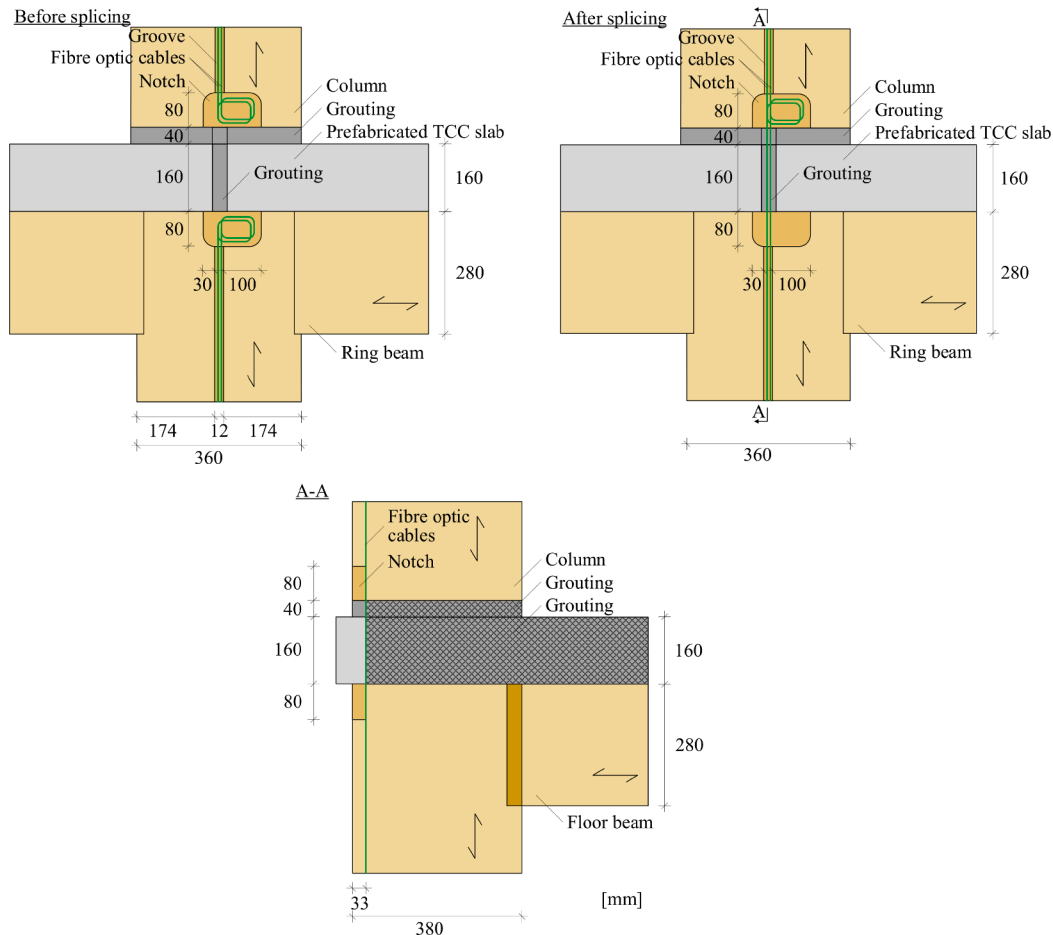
Detail of cable installation along column and ceiling transition: Front view before and after splicing, and cross-section; units in mm (adapted from ERNE AG Holzbau).
